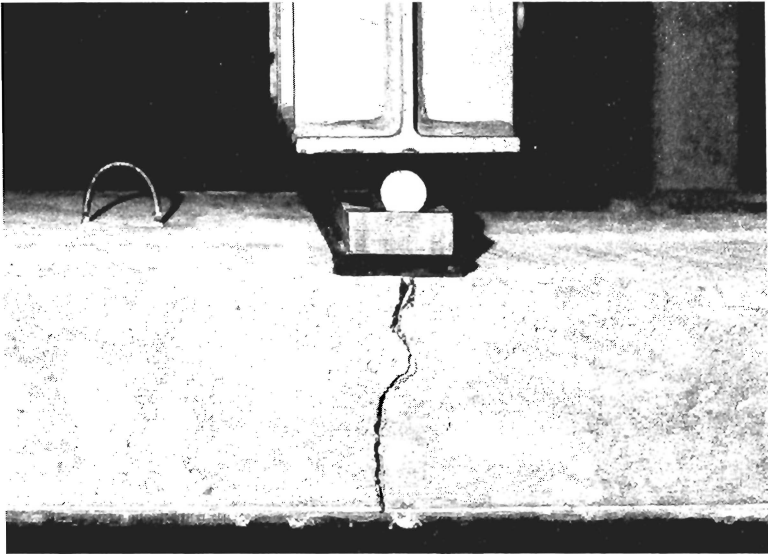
Photograph Showing Typical Shear-Bond Failure Crack
